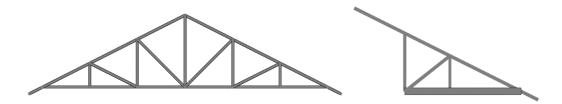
Left: Truss 1 in Figure 4. Right: Truss 2 in Figure 2
